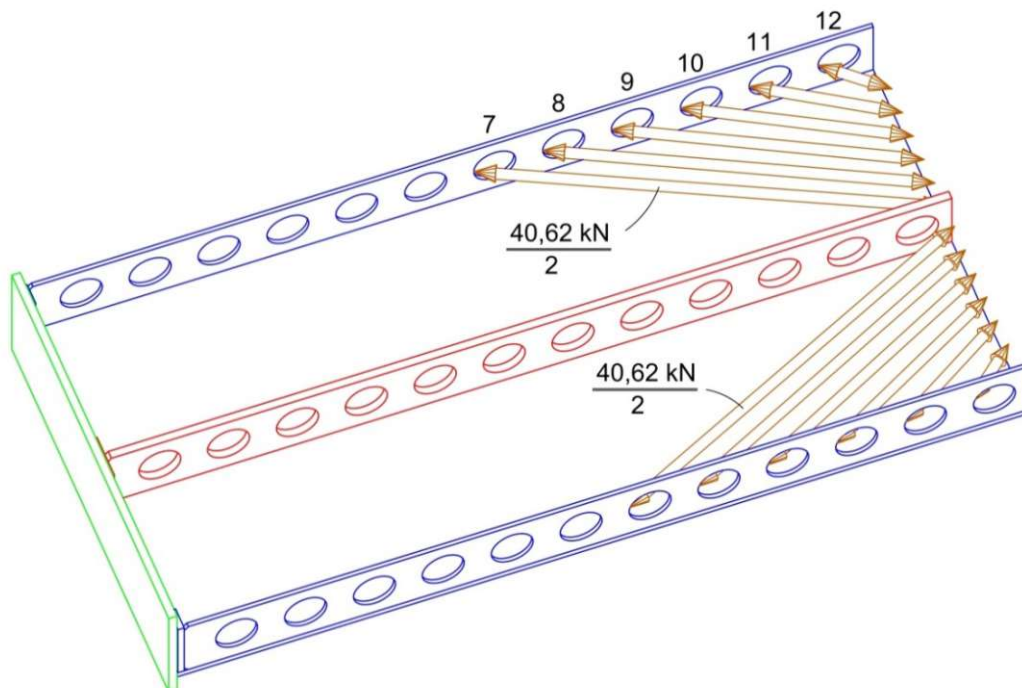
The brown struts show the horizontal force transfer between the bottom steel section and the plane of symmetry
